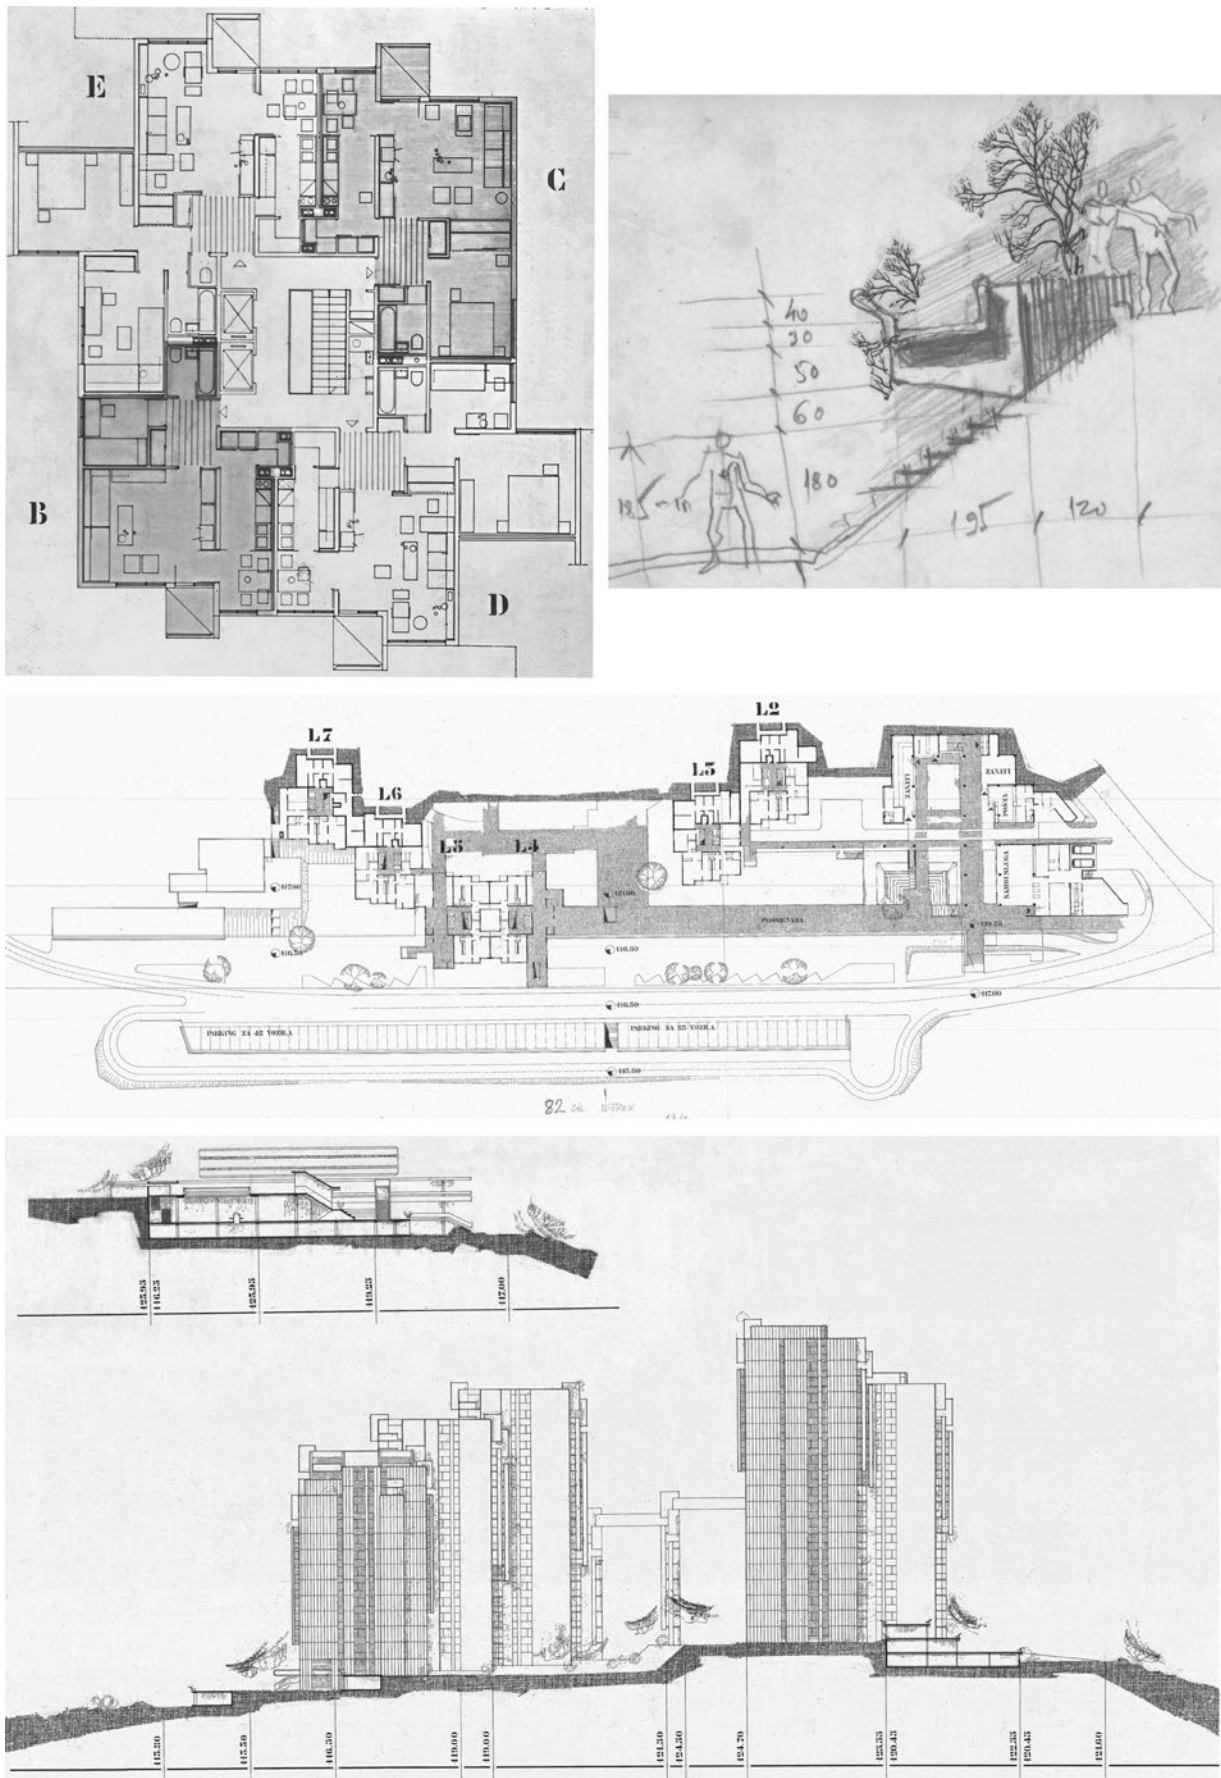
Milan Lojanica, Julino brdo settlement (1970). Original drawings: Typical floor plan (top-left); Walkway throughout the staircase and verdure – Sketch (top-right); Structures L2-L7 – landscape layout (middle); Settlement cross-section – walkway with a staircase (below)
